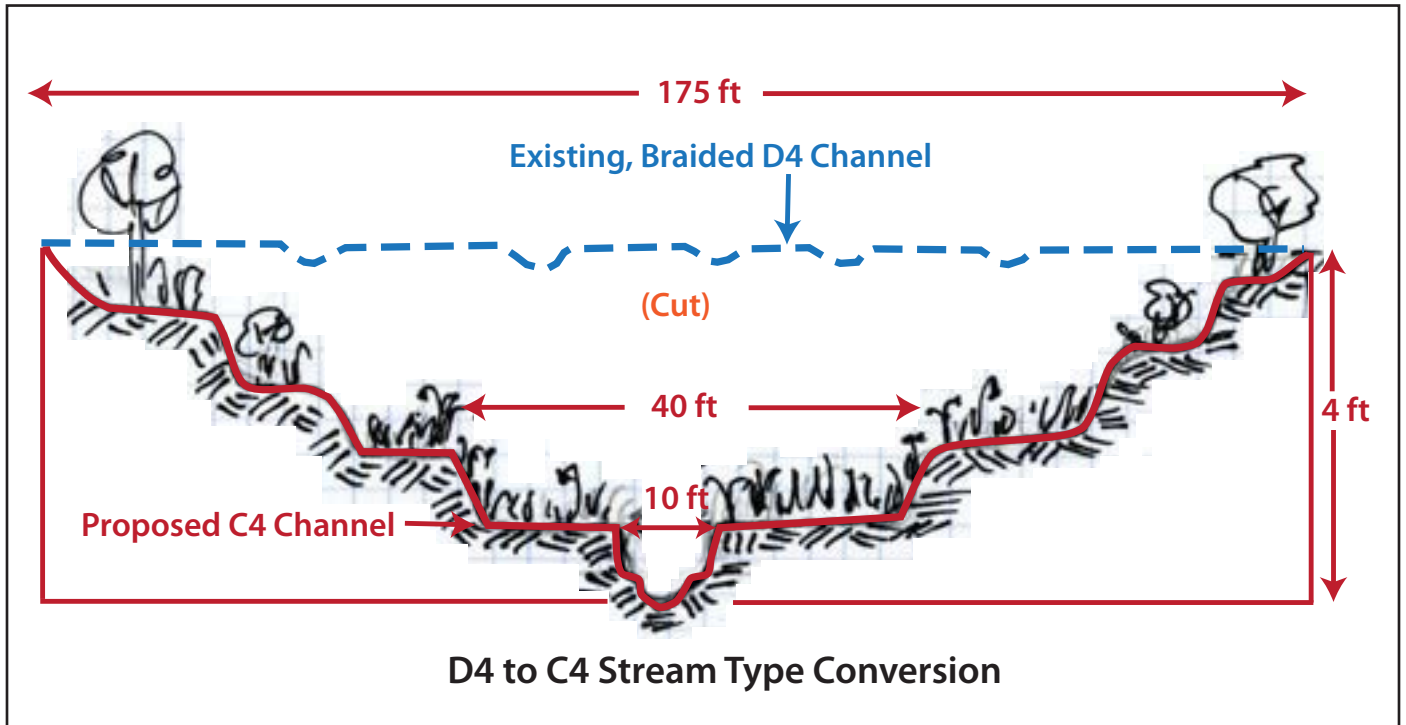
Schematic of the proposed excavation and shaping of a multi-stage channel and valley cross-section for the D4 to C4 stream type conversion below the West Creek road crossing.
